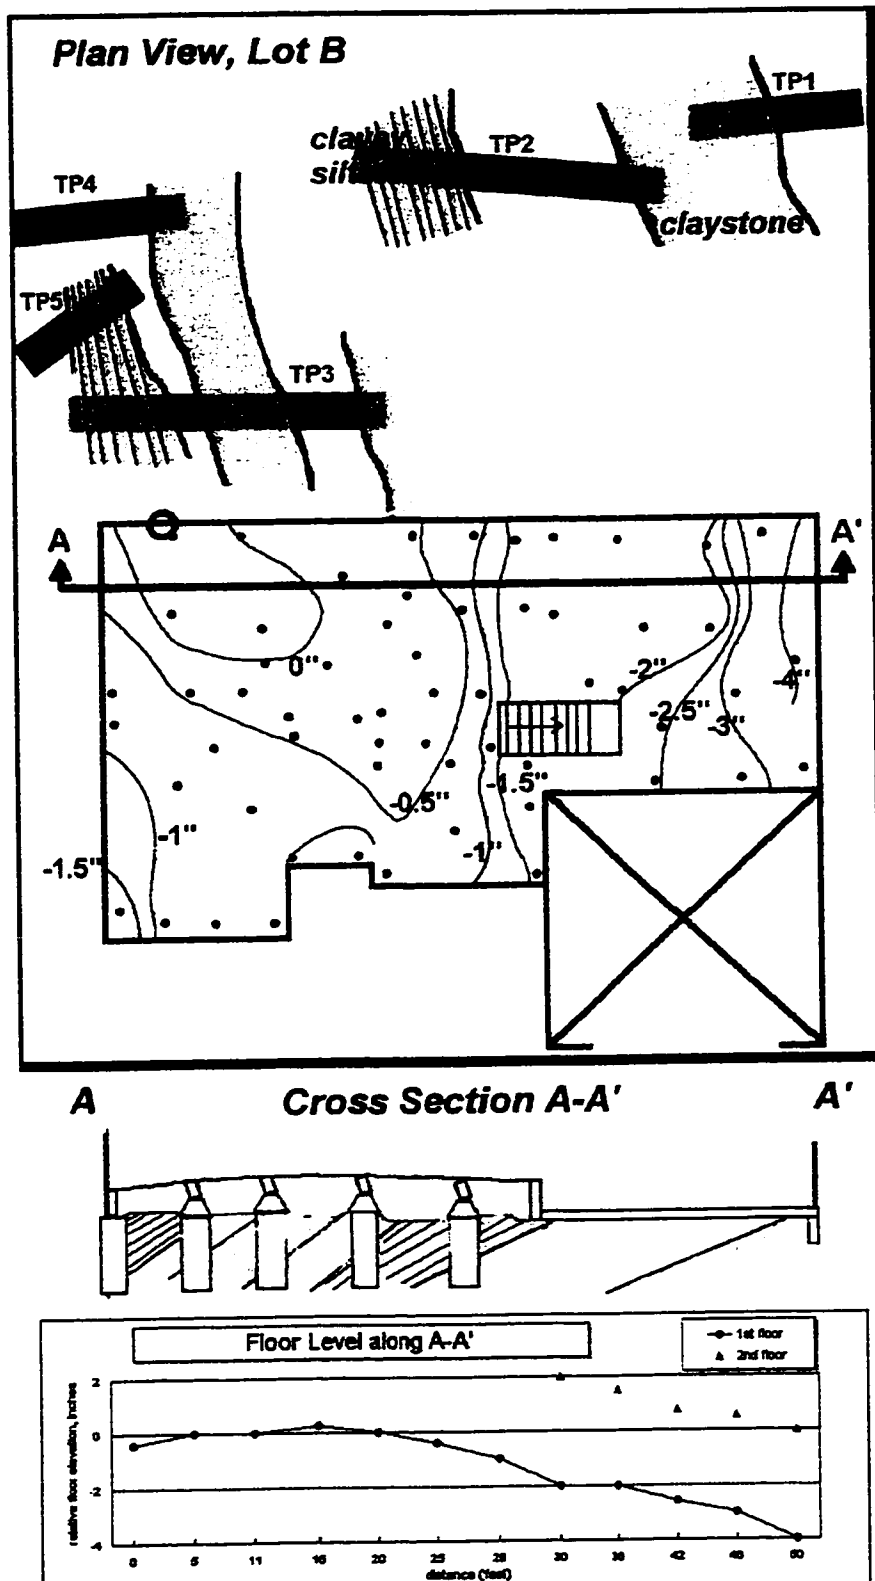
Plan view and cross-section, case study 5, lot B, showing the location of the expansive claystone beds relative to the house and to the floor level contours.
